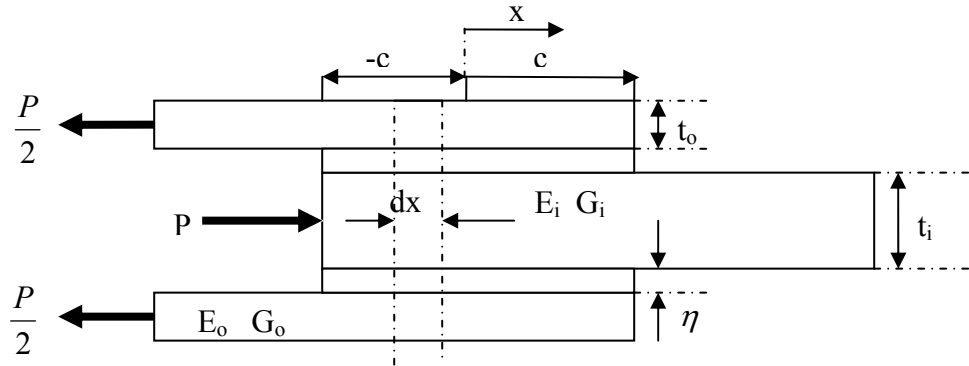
Geometry and material parameters of the CFRP Plate-Concrete Prism Under Tension-Compression
